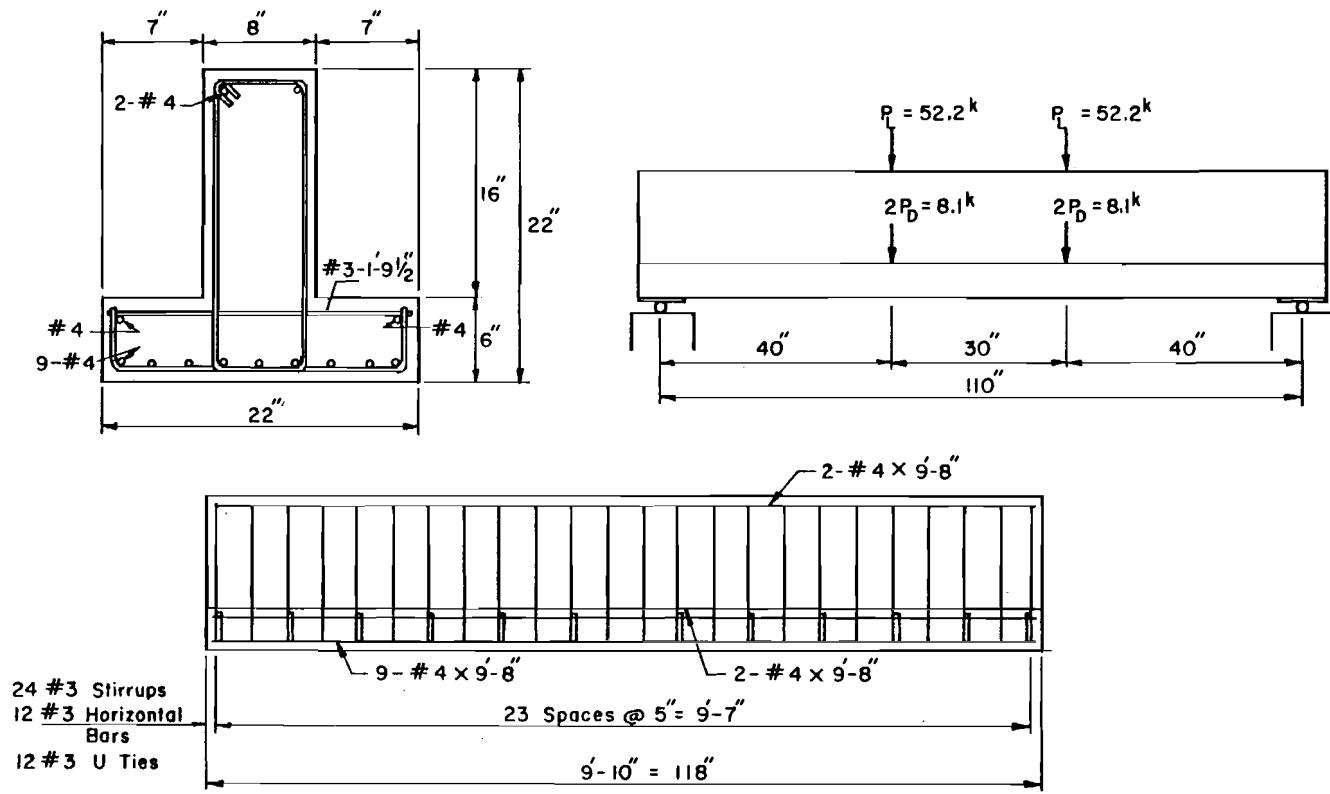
Dimensions, reinforcement, and predicted maximum loads for Beams BMS1 and BMSP1
